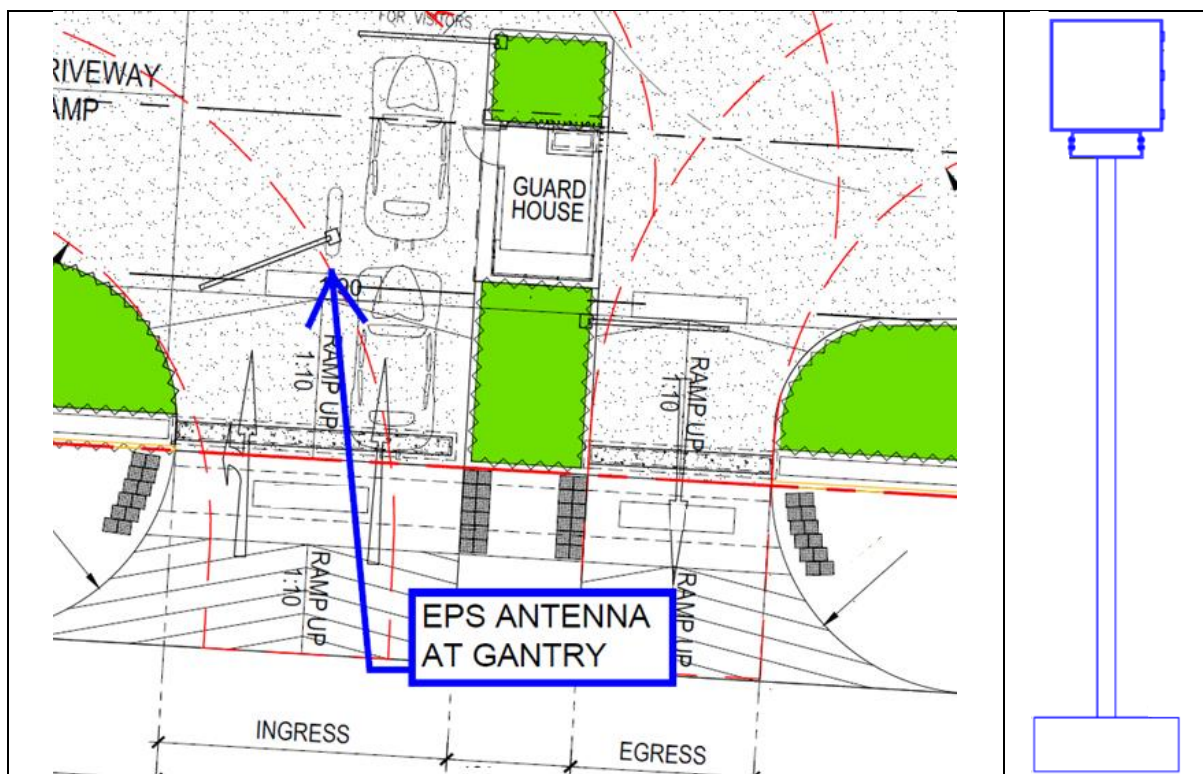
Example plan drawing of EPS antenna located at driver's side and installation detail of EPS antenna
